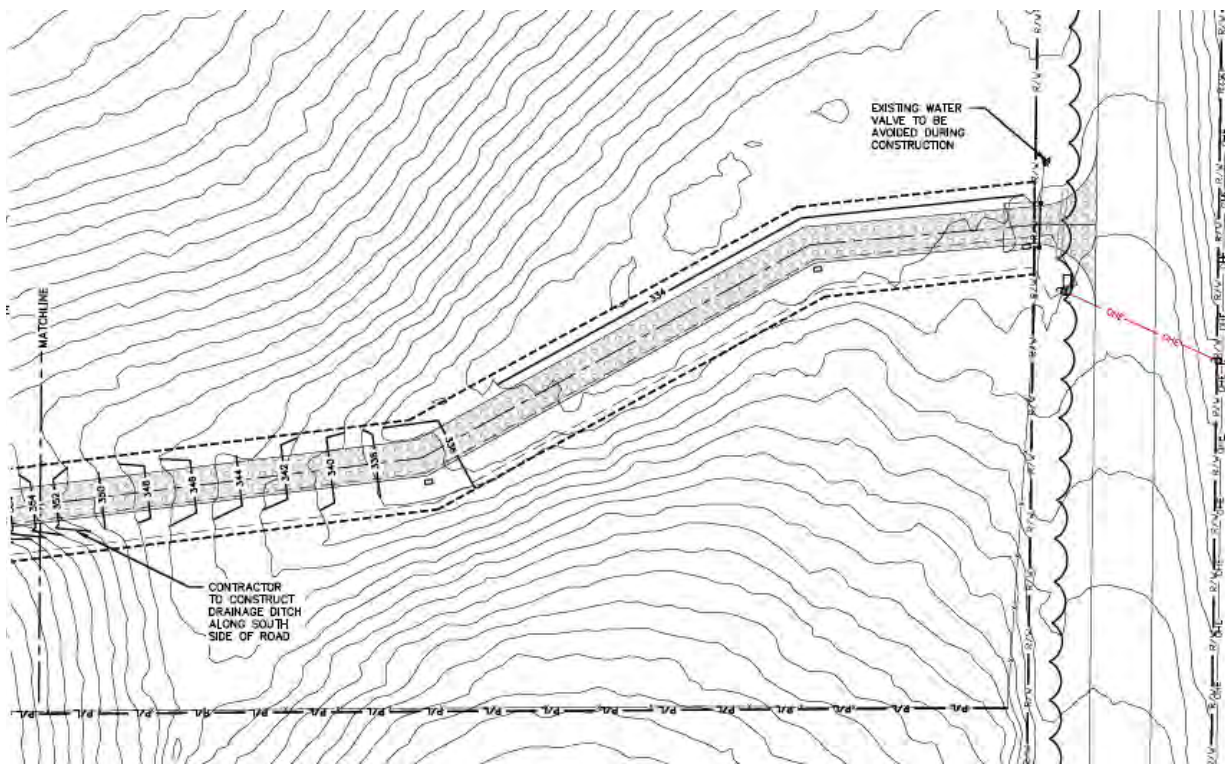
Site Plan with Stormwater and Sediment Controls continued
